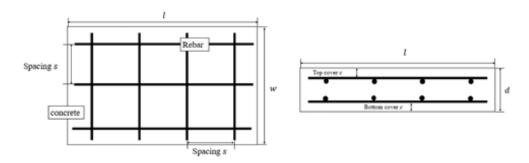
Proper spacing in tying reinforcement bars
